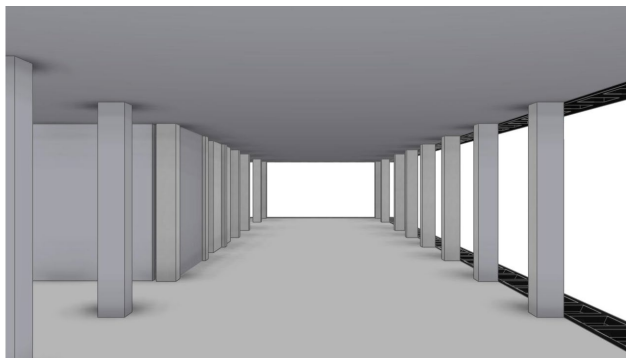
Modeling of typical floor on the summer solstice (by Author)
